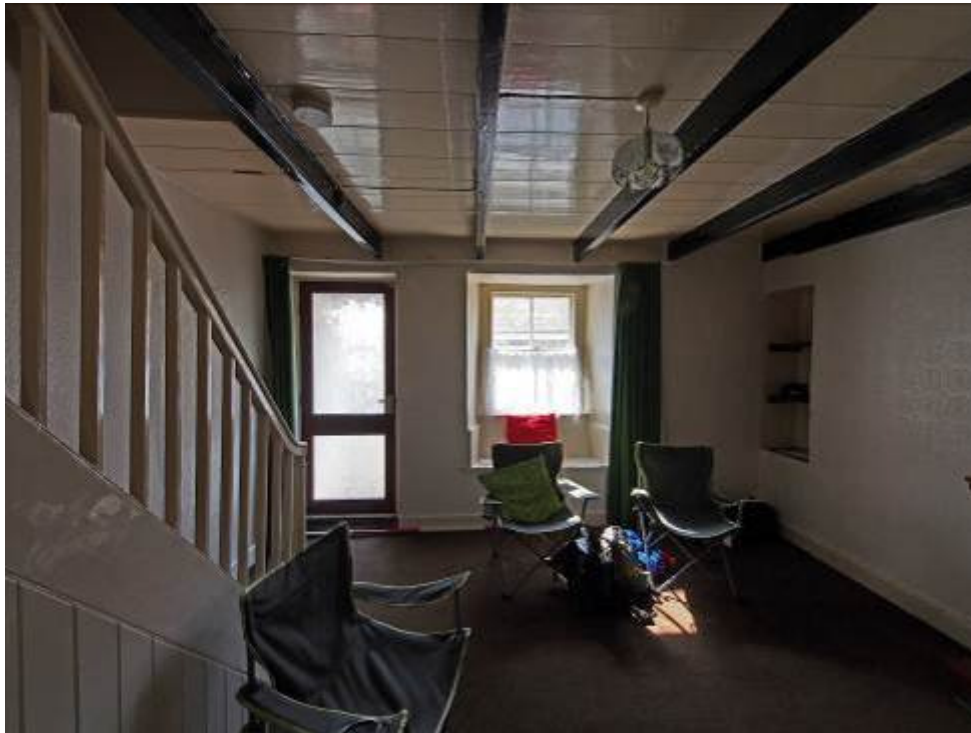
Ground floor S room (St Eia Street); blocked fireplace in right hand (W) wall and blocked doorway to left of existing door, which would have provided internal connection through to No. 17 Teetotal St; original stair banister & panelling
